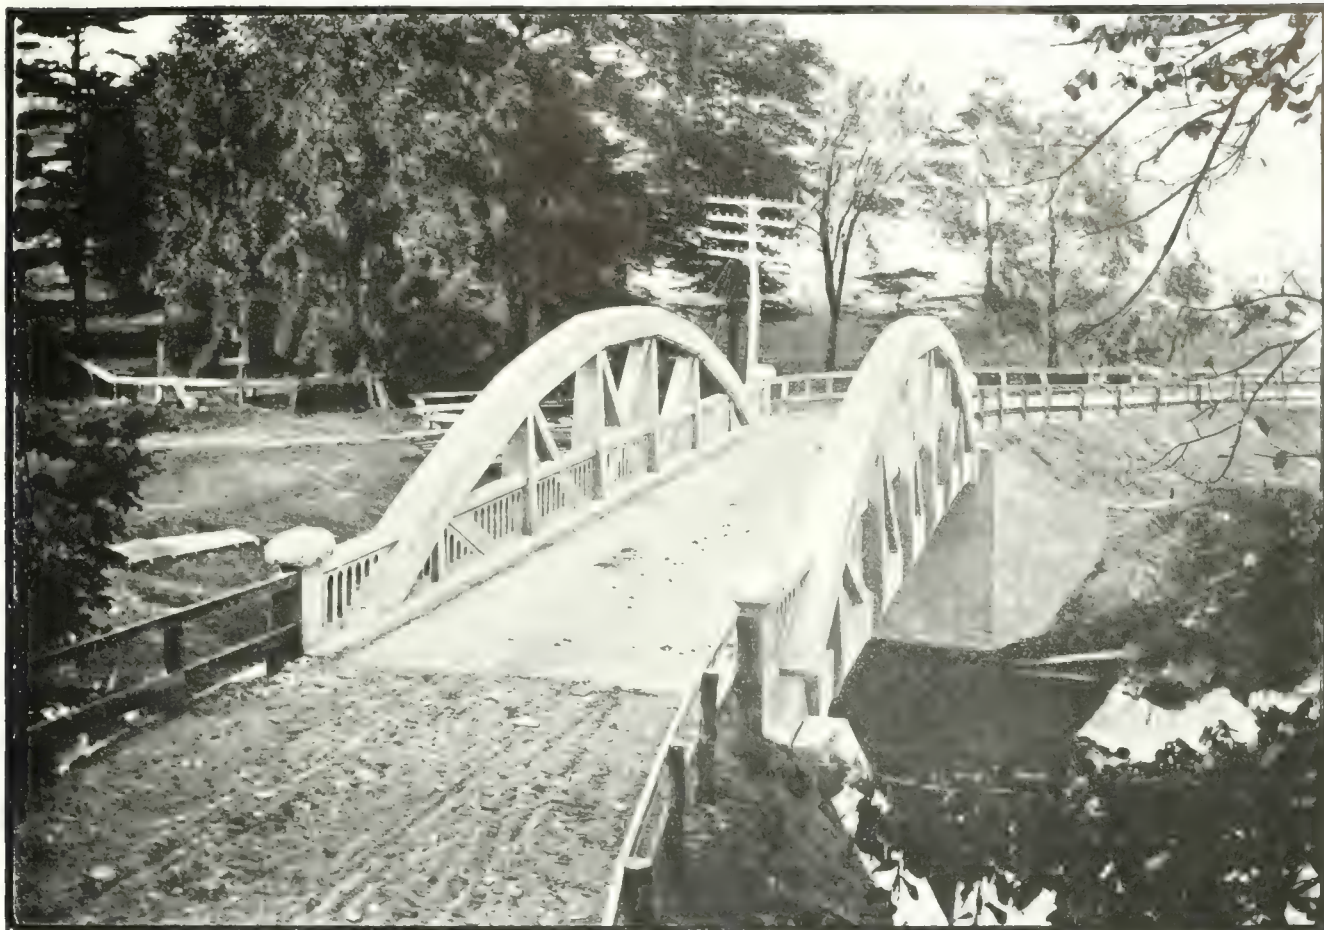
The Middle Road Bridge over the Etobicoke River Between the Counties of York and Peel. This 82-foot Span is the Only Concrete Truss Span in Canada, and One of the First in America. Existing Masonry Abutments and a 5 Per Cent. Grade were Among the Conditions Responsible for its Adoption. Barber & Young, Engineers.
